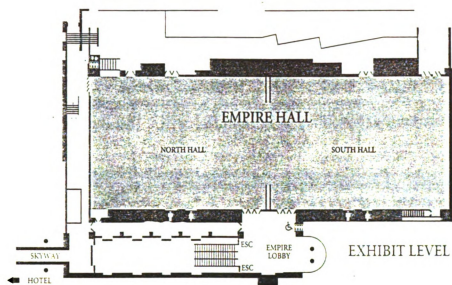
Floor plan of the Rochester Riverside Convention Center.
